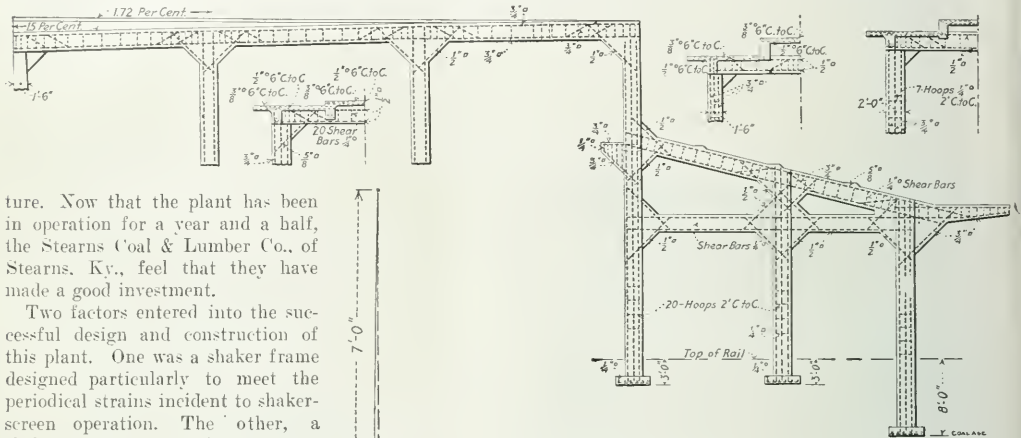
ELEVATION OF CONCRETE TIPPLe
